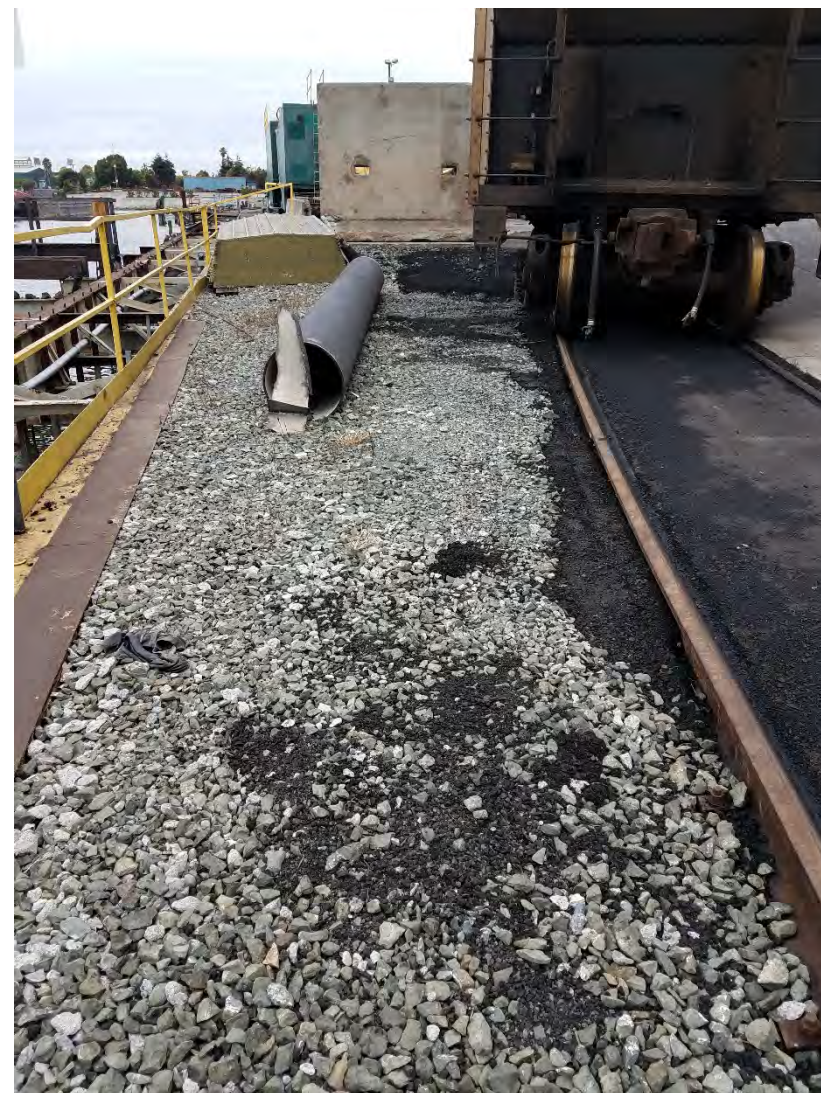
Looking north: gravel cover to the west of new asphalt pavement south of treatment system TS-2 and interceptor SW-5.
